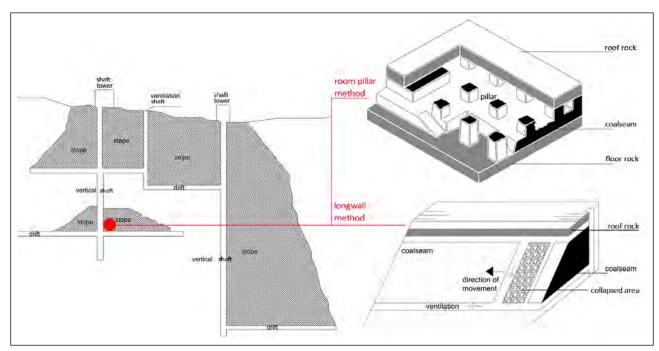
Schematic section of hard coal mines and modelling of longwall and room-pillar method.
